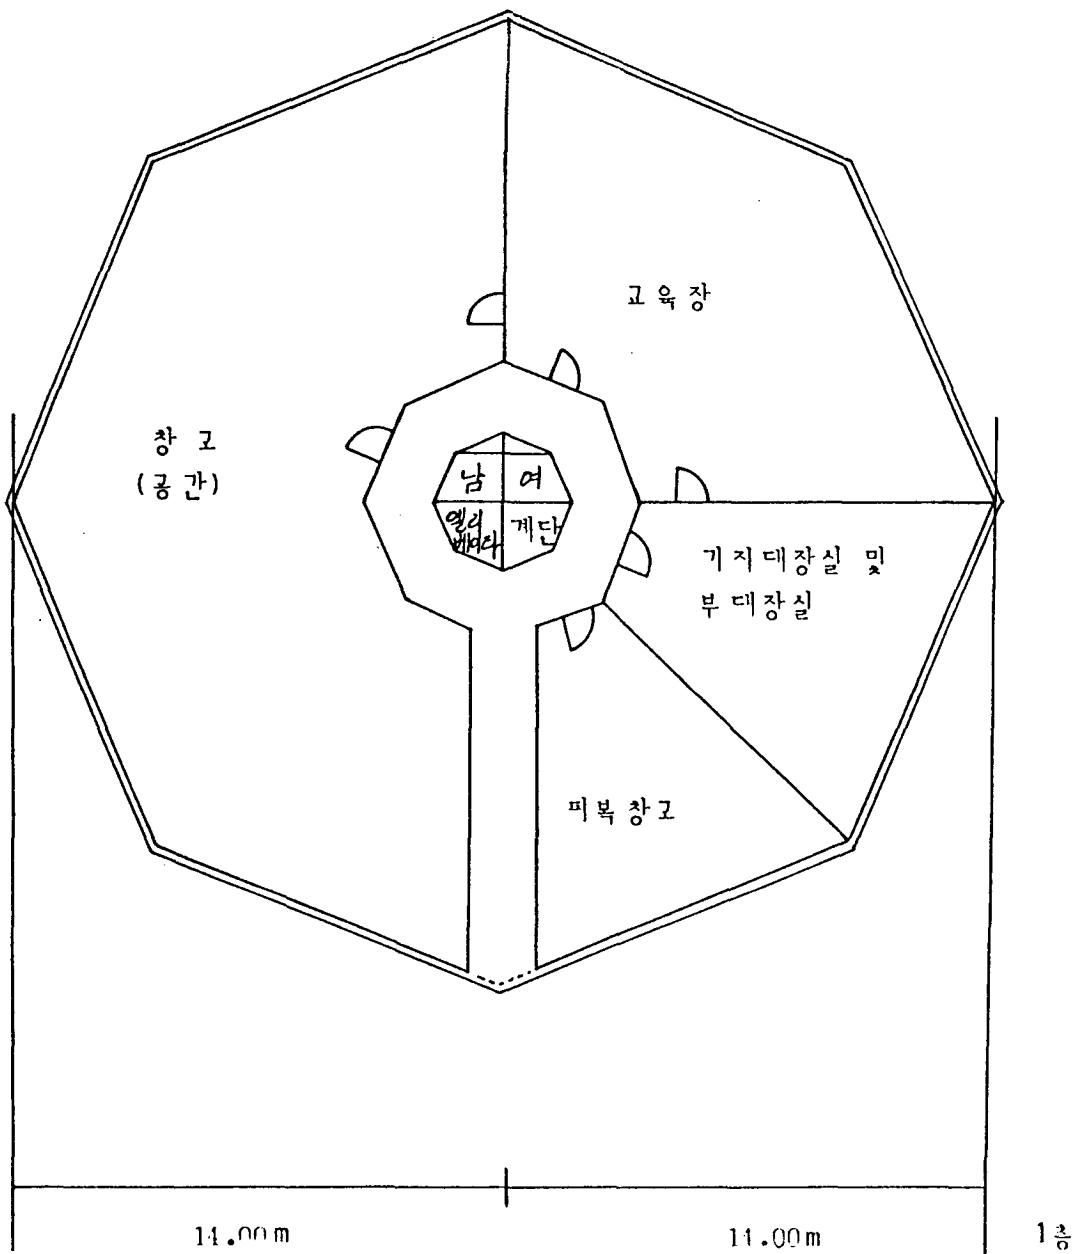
The first floor arrangements of the proposed polar research building.
